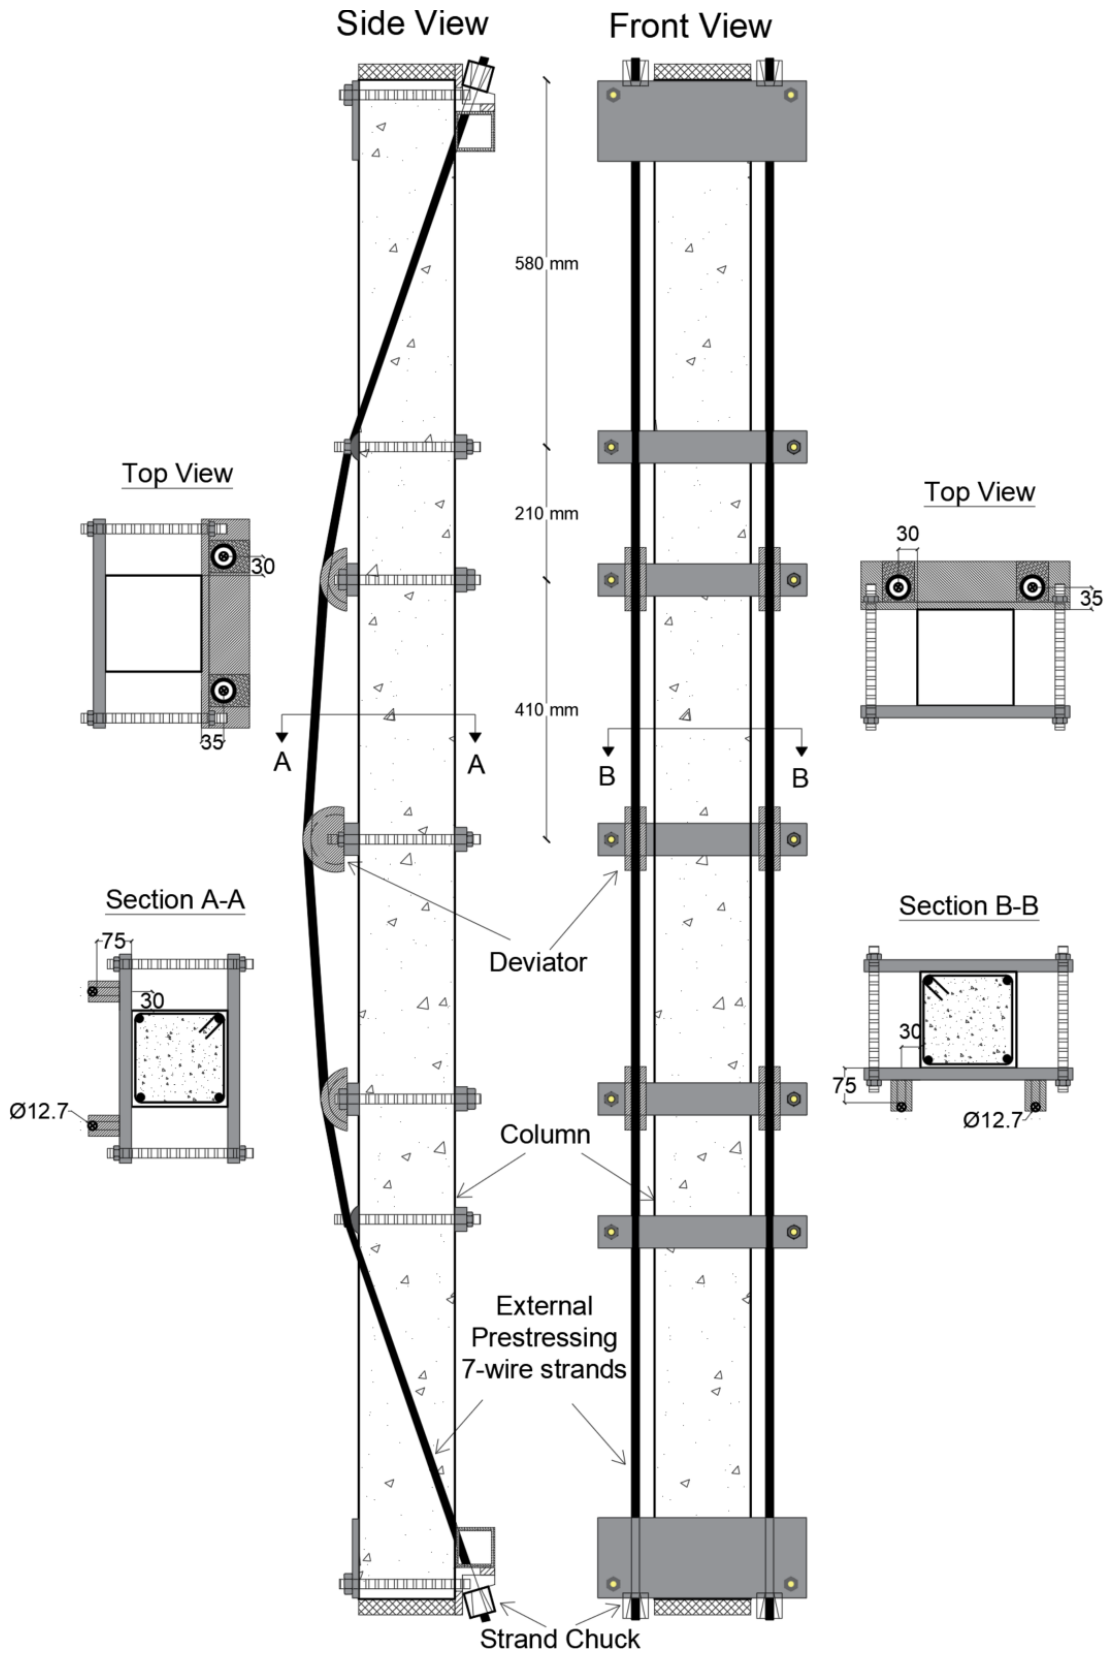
Column with two external prestressing strands having a parabolic profile.
